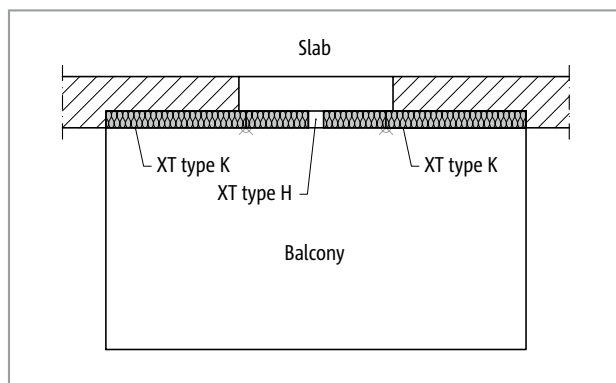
Schöck Isokorb® XT type H: Balcony freely cantilevered
